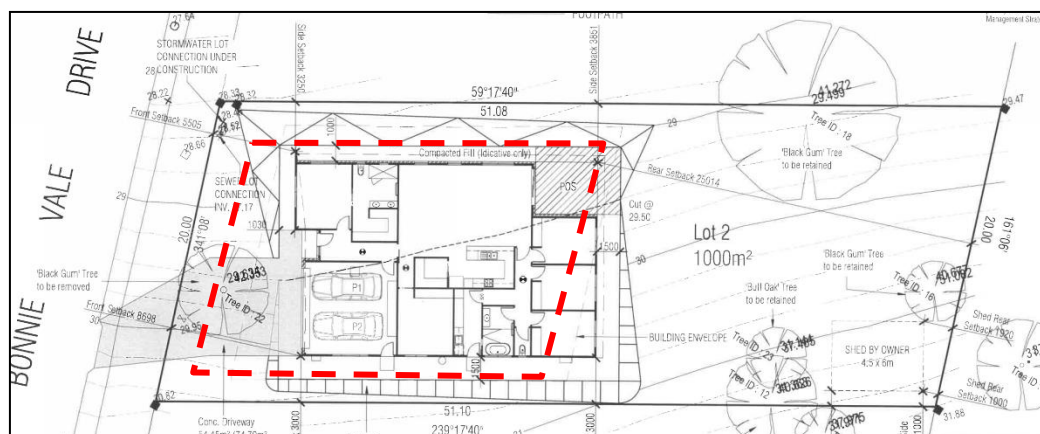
Extract of site plan showing the building area HIJK (red dashed) and development
